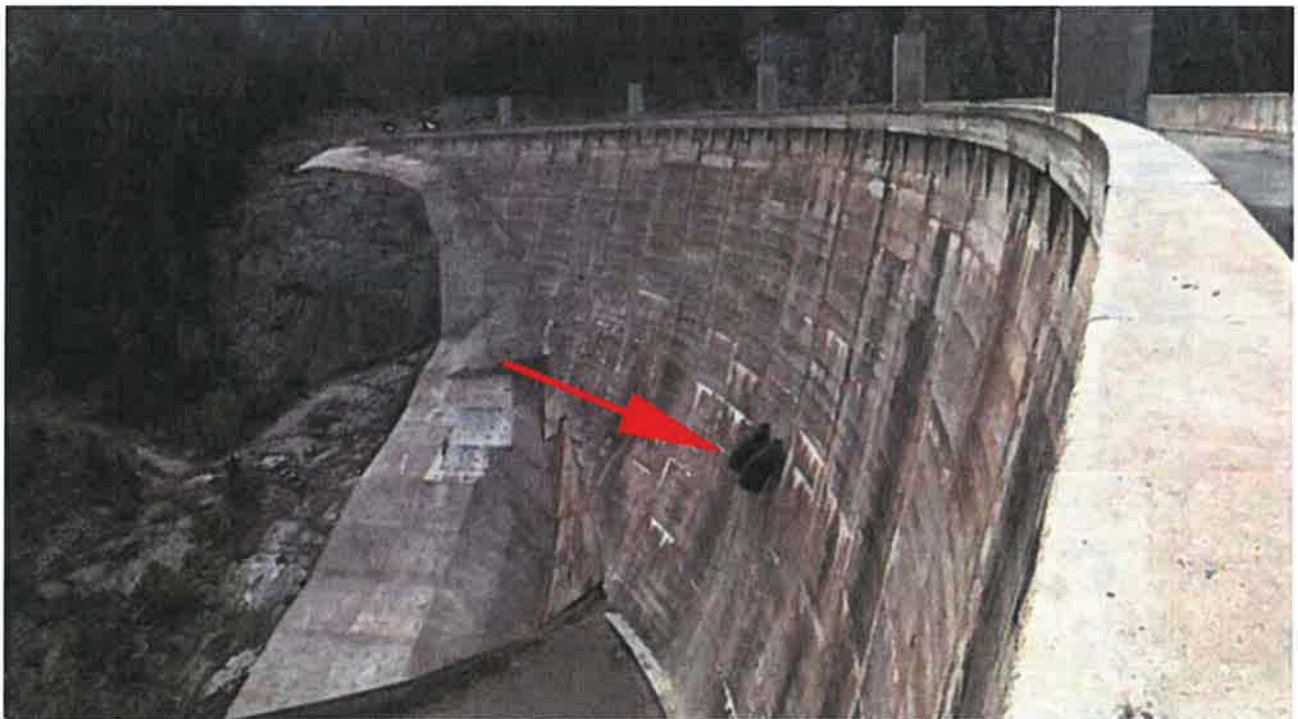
Photo showing two, 6-ft diameter, power penstocks constructed at elevation 4660 to facilitate future hydropower development. Note the top of the concrete wall on the dam crest has an elevation of 4729.
